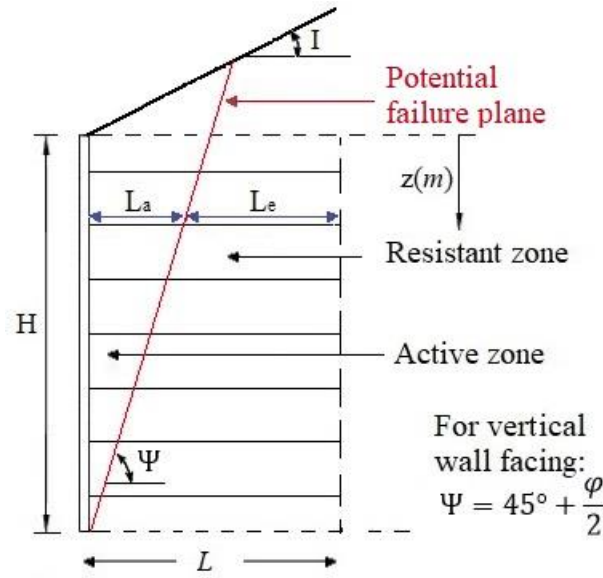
Line of maximum tension forces for internal stability design of reinforced soil retaining walls
